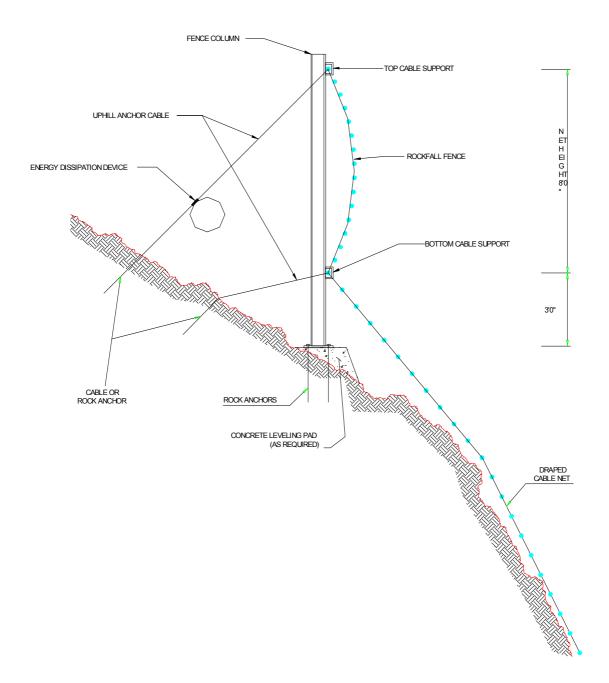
Profile of typical rockfall mitigation fence with draped cable net.
